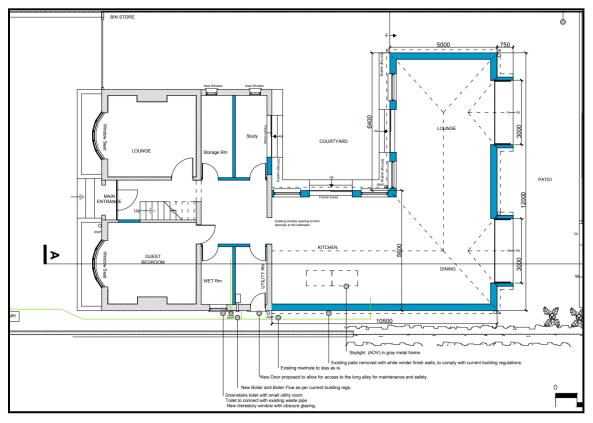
Proposed Ground Floor Plan (blue area denotes extension)
